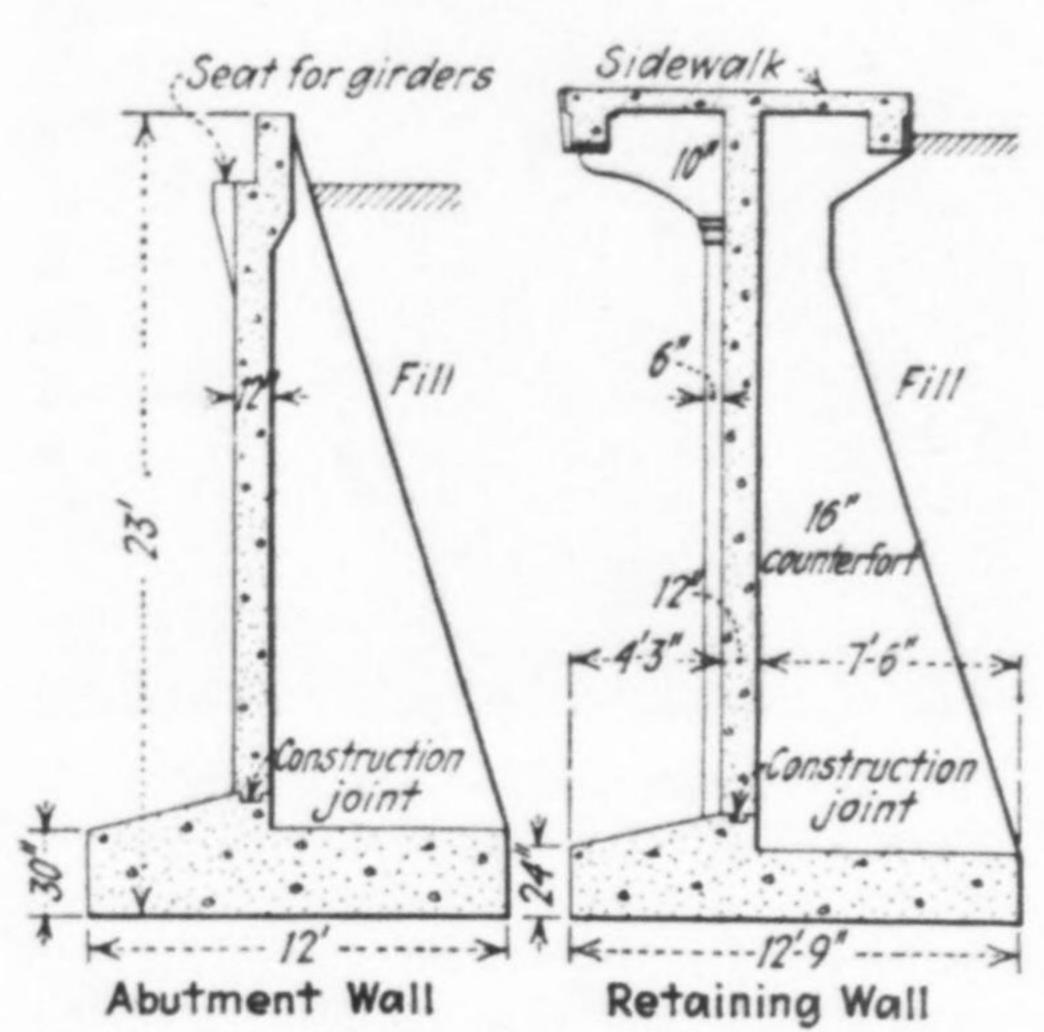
Walls for filled approaches. Note T-head retaining walls forming sidewalks.
